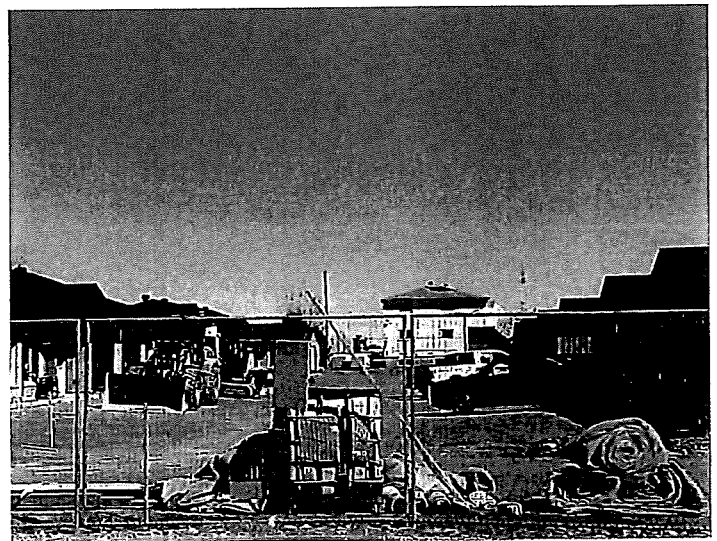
View of the Existing Building Facing East (from the west end of the Row Dwelling Complex)
